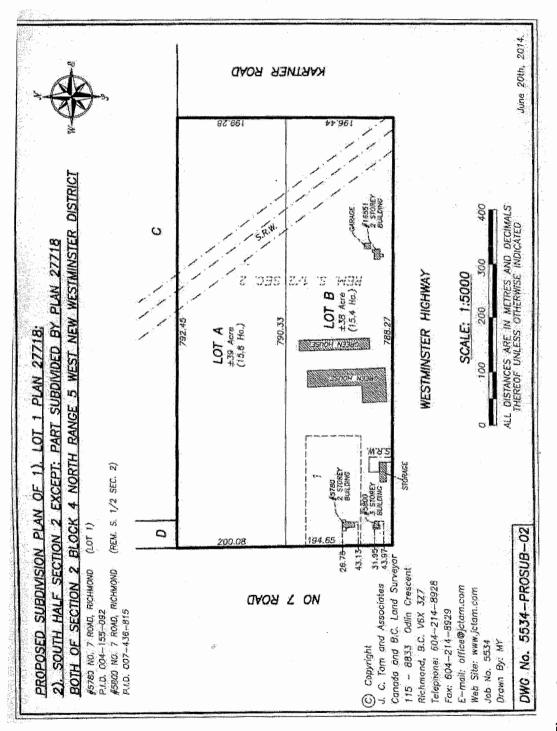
Layout of Mahal Farms Ltd., showing Proposed Lots A and B
